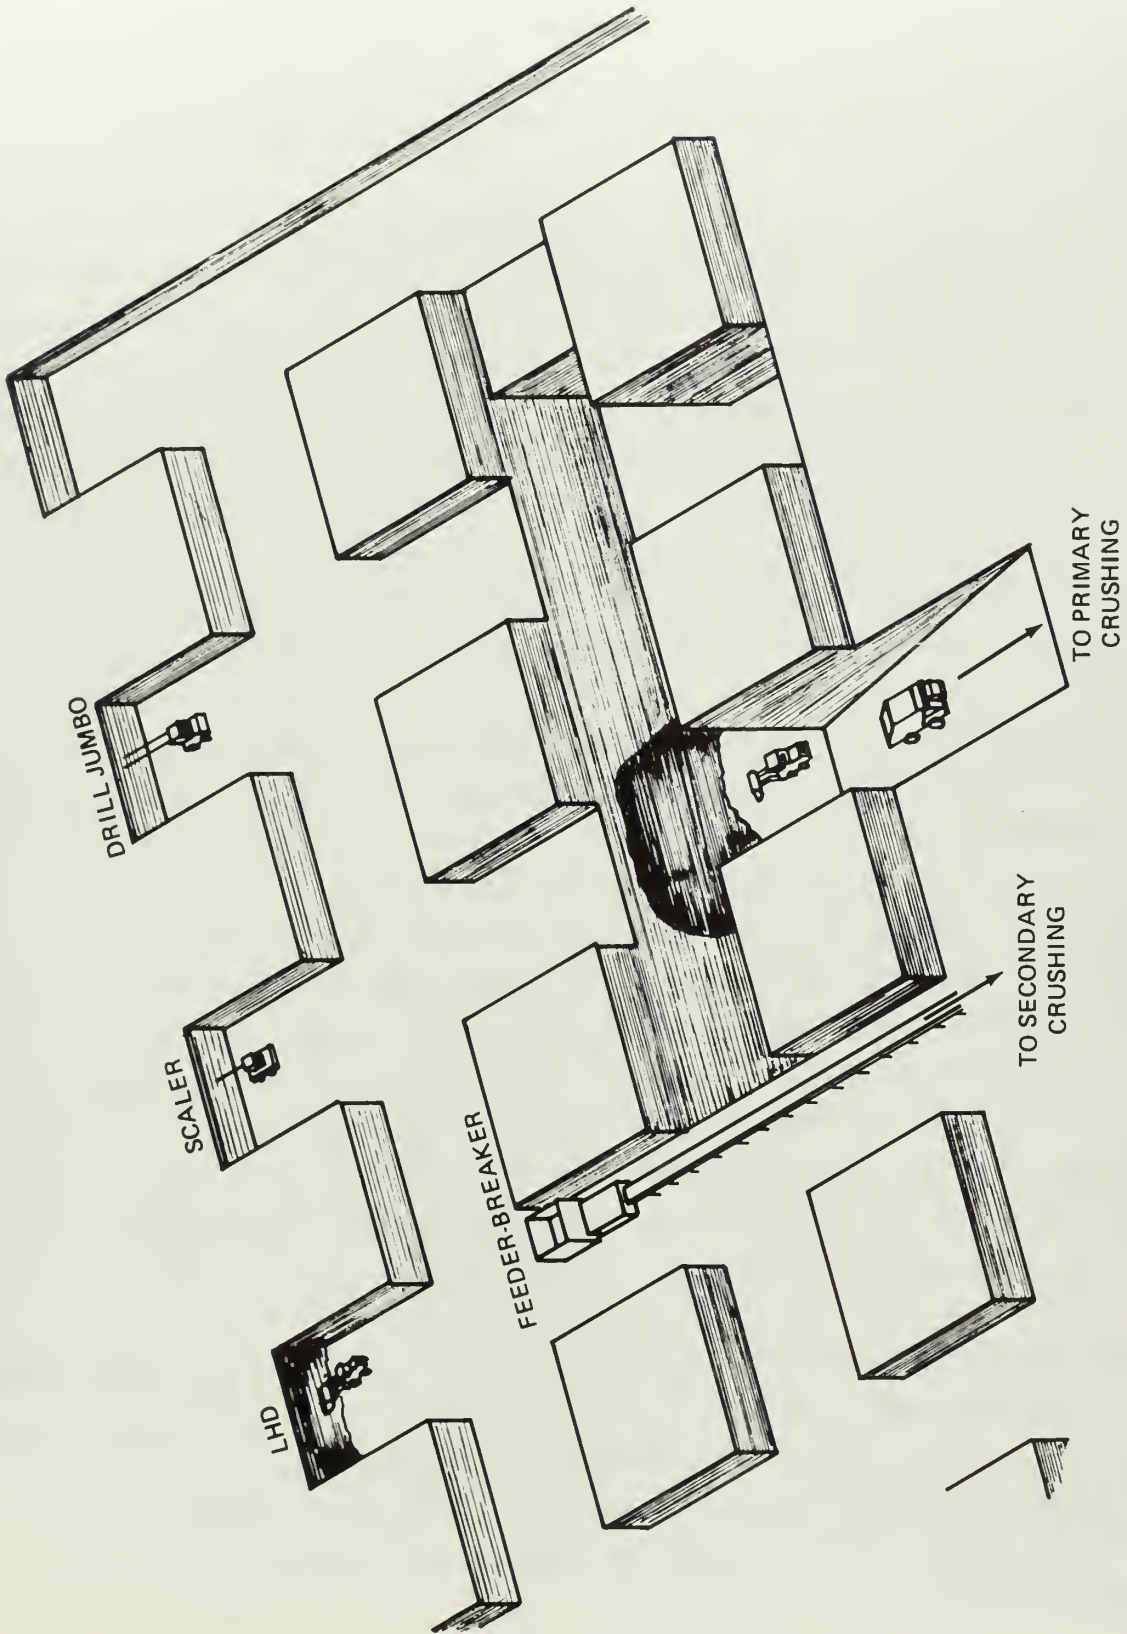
ROOM-AND-PILLAR TWO-BENCH MINING SYSTEM
